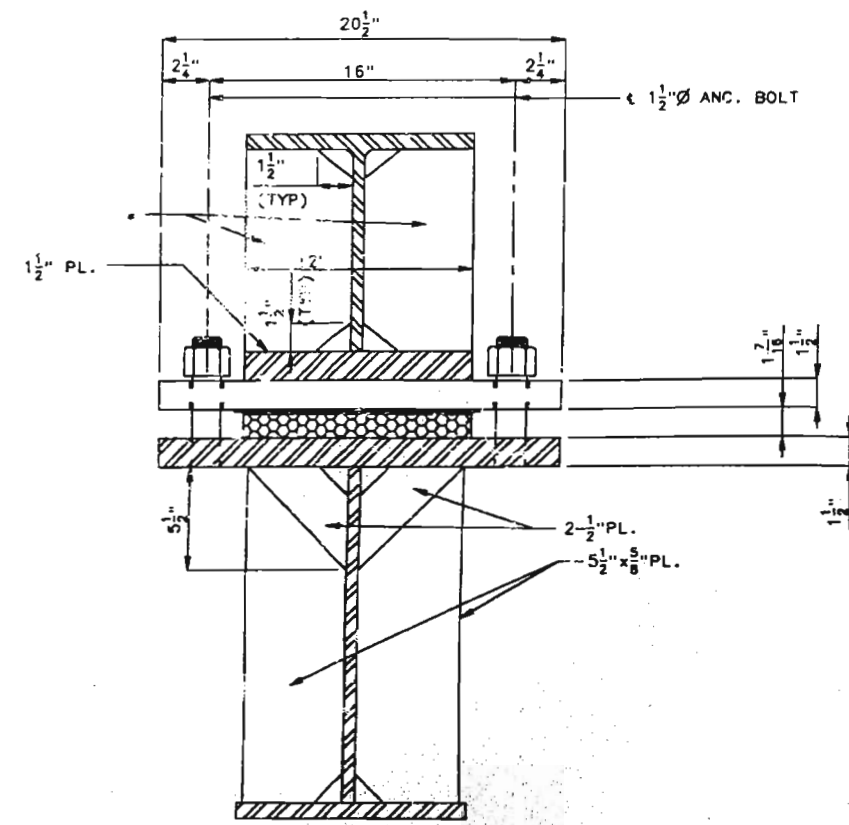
DETAILS SHOWING HINGE #4 & #7 CONNECTION
